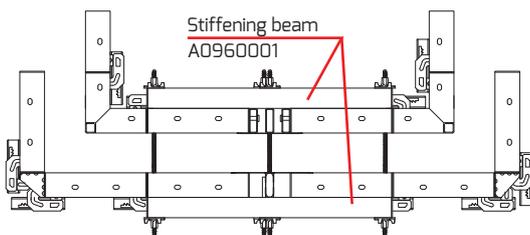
Sample formwork compensation with the stiffening beam
